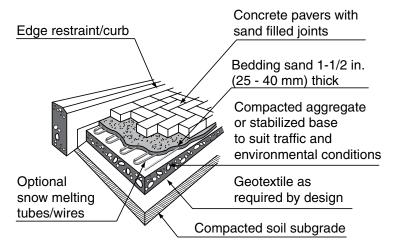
Snow melting system with concrete pavers for pedestrian areas or residential driveways
